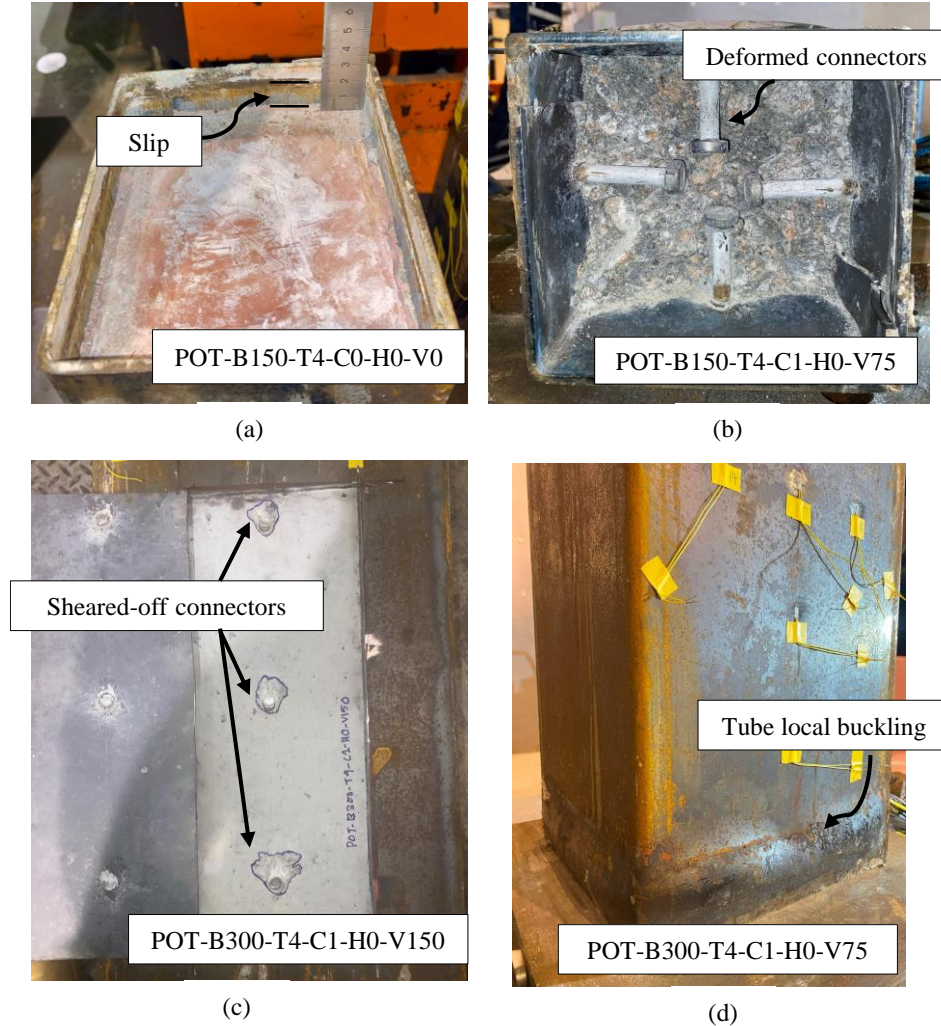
Failure modes of the tested specimens, (a) concrete slip-out, (b) deformed connectors, (c) sheared-off connectors, (d) local buckling of tube wall.
